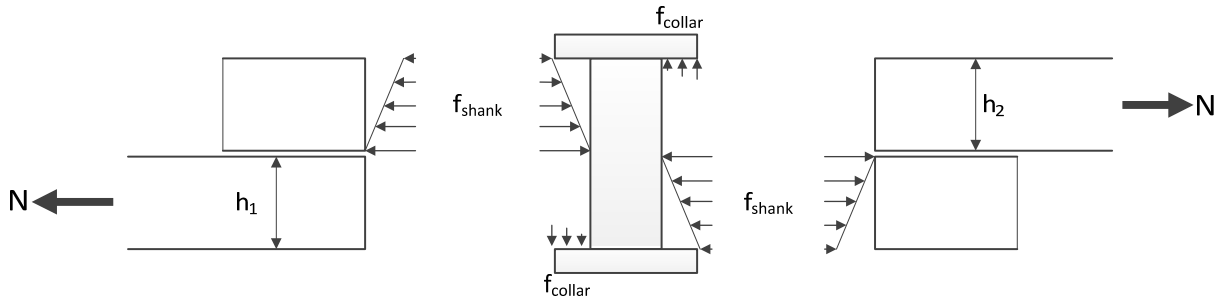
Contact Forces in the Fastener and Plates in Single Shear
